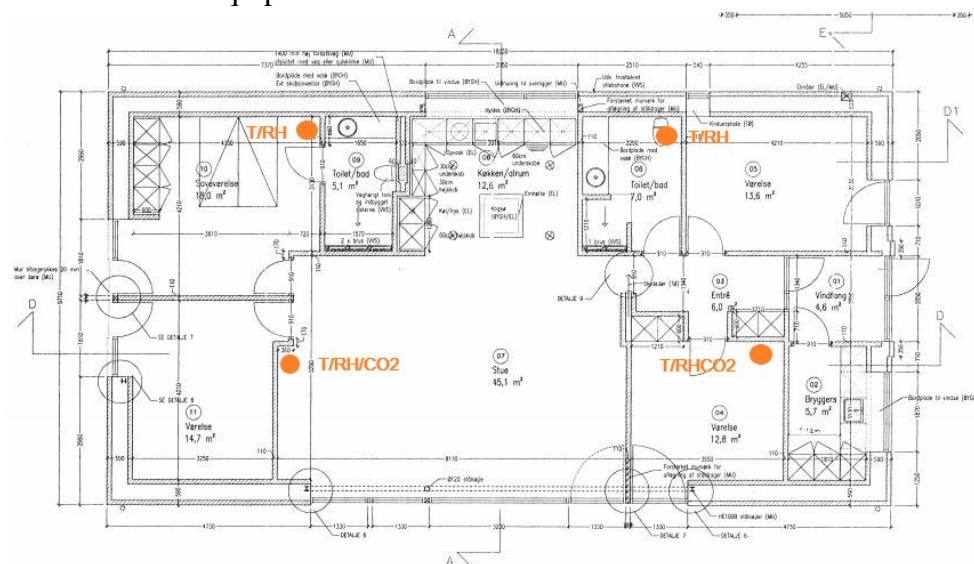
Floor Plan of Stenagervænget 12 - Sensor Position
